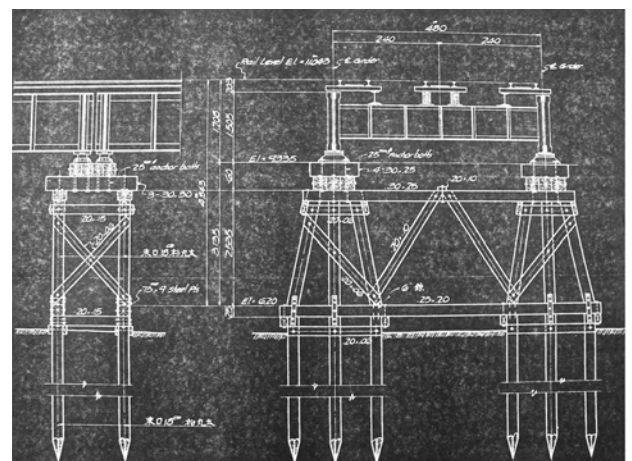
Scaffoldings for Erection (Ise-Ohashi Bridge)
